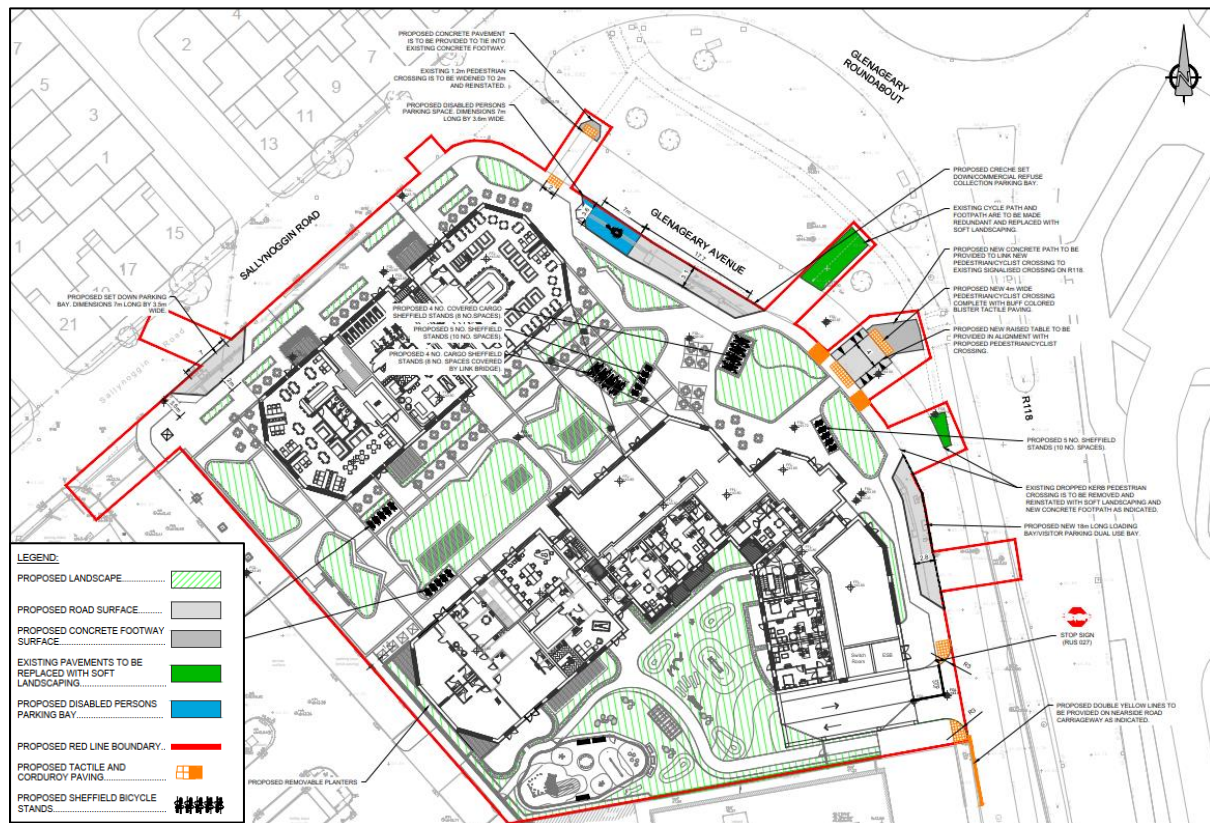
General Arrangement detailing proposed new shared pedestrian and cyclist priority crossing point (Source: AECOM Drawing 60690914-ACM-00-00-DR-CE-10-0001)
